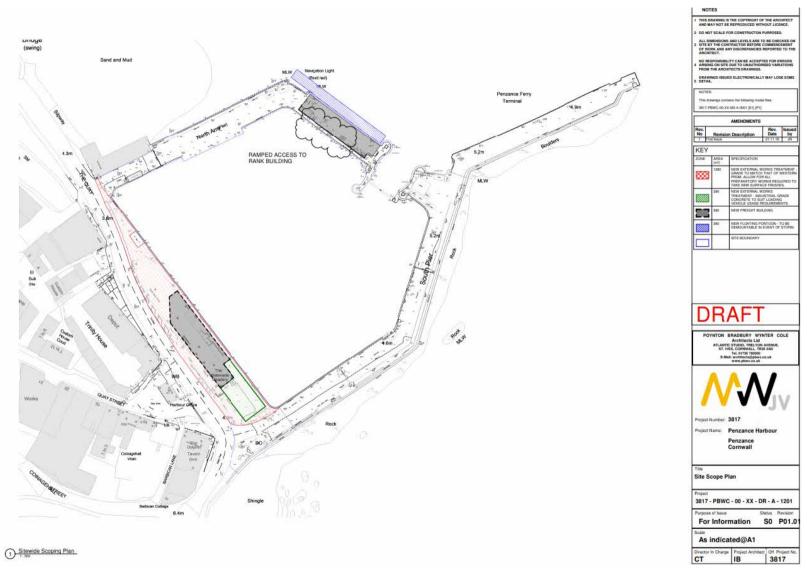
Proposal plan for Area 1 showing footprint of new building to on the western quayside, areas of proposed new surfacing and location of new floating pontoon.
